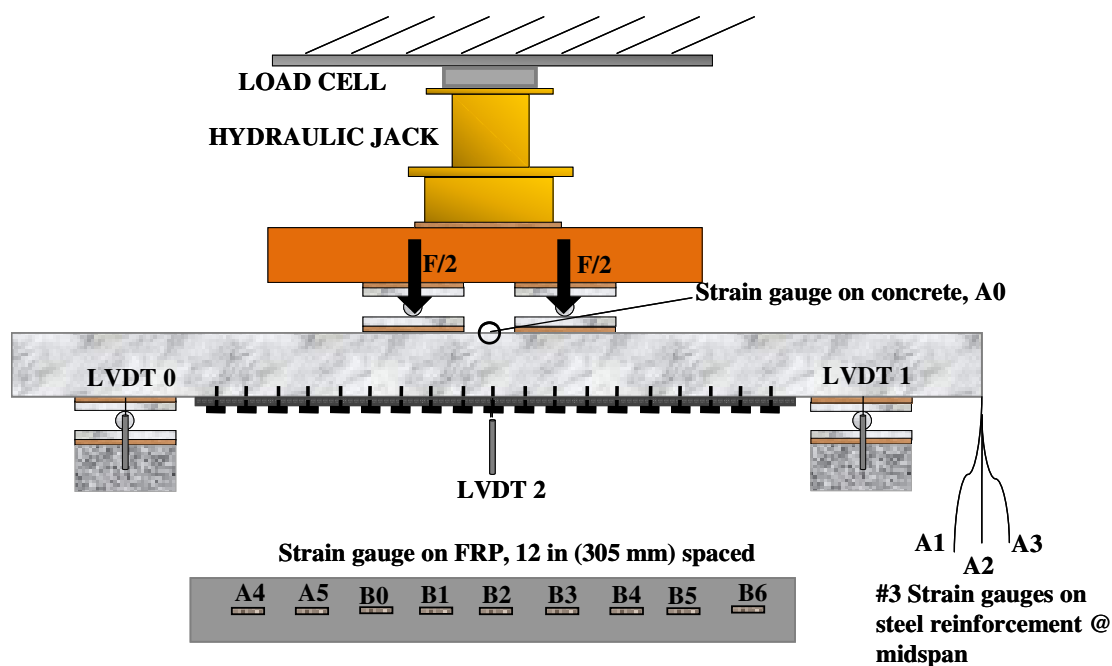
Typical instrumentation of FRP strengthened test specimens
